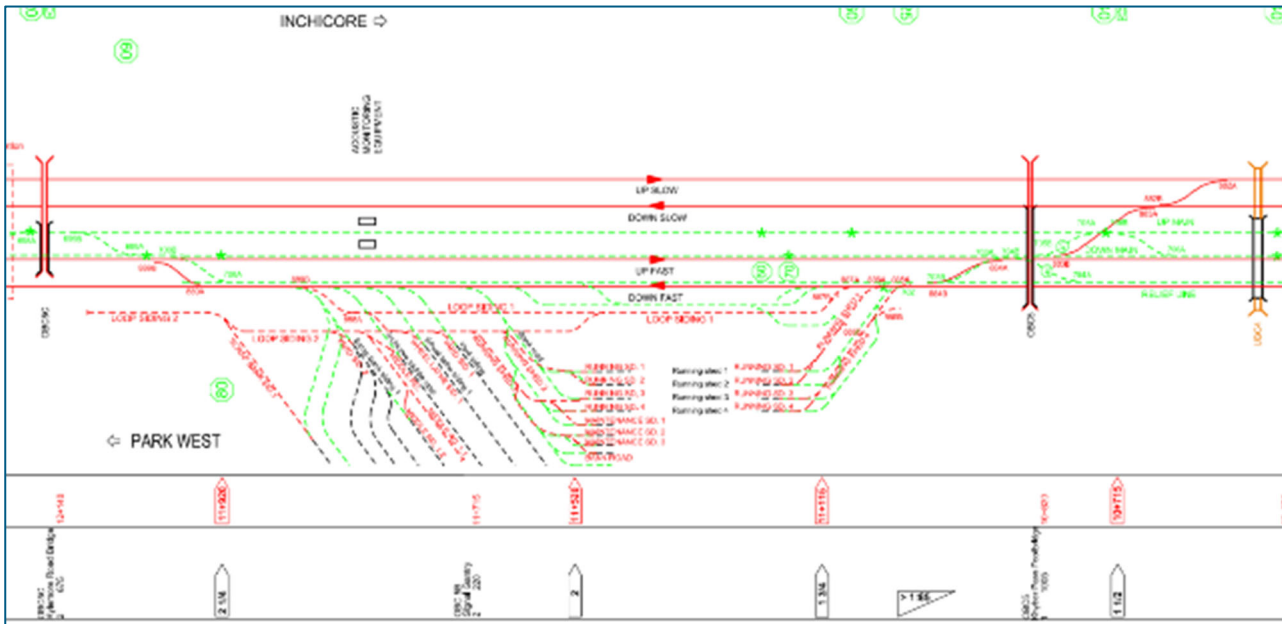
Kylemore Road Bridge (OBC5C) to Sarsfield Road Bridge (UBC4) Track Plan Layout
